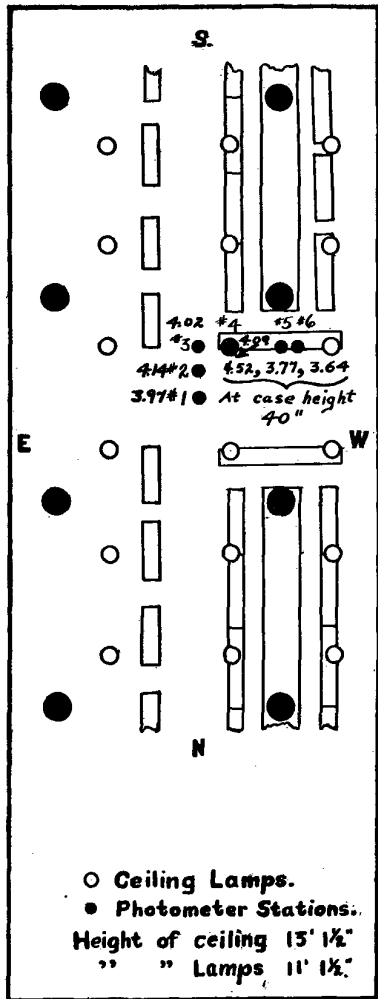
Section plan of fourth floor, (gentlemen's hats), showing location of furniture, pillars, lighting units, test stations and illumination data.
